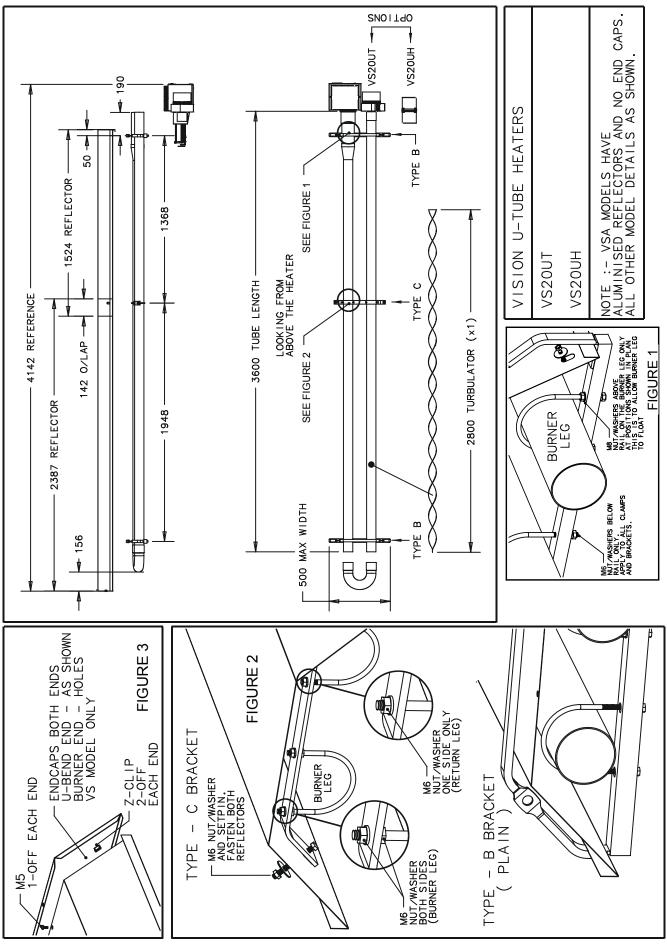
Vision Heater Assembly: Models VS/VSA U tube 20kW.
